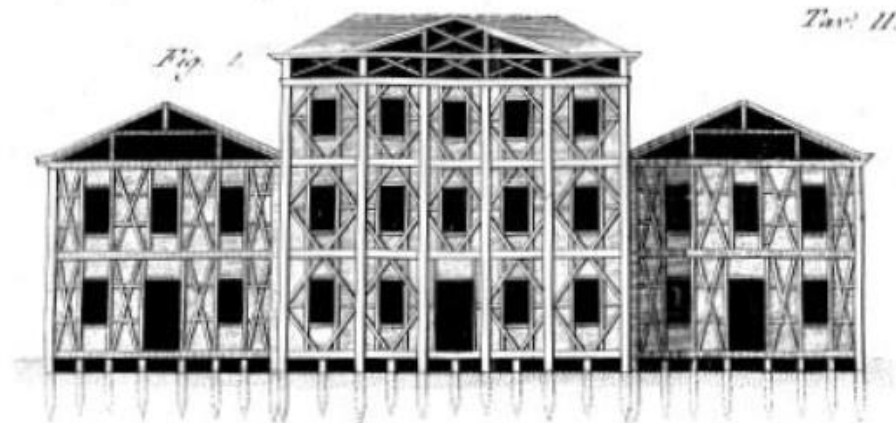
Casa Baraccata façade. (Poletti, 2013)
